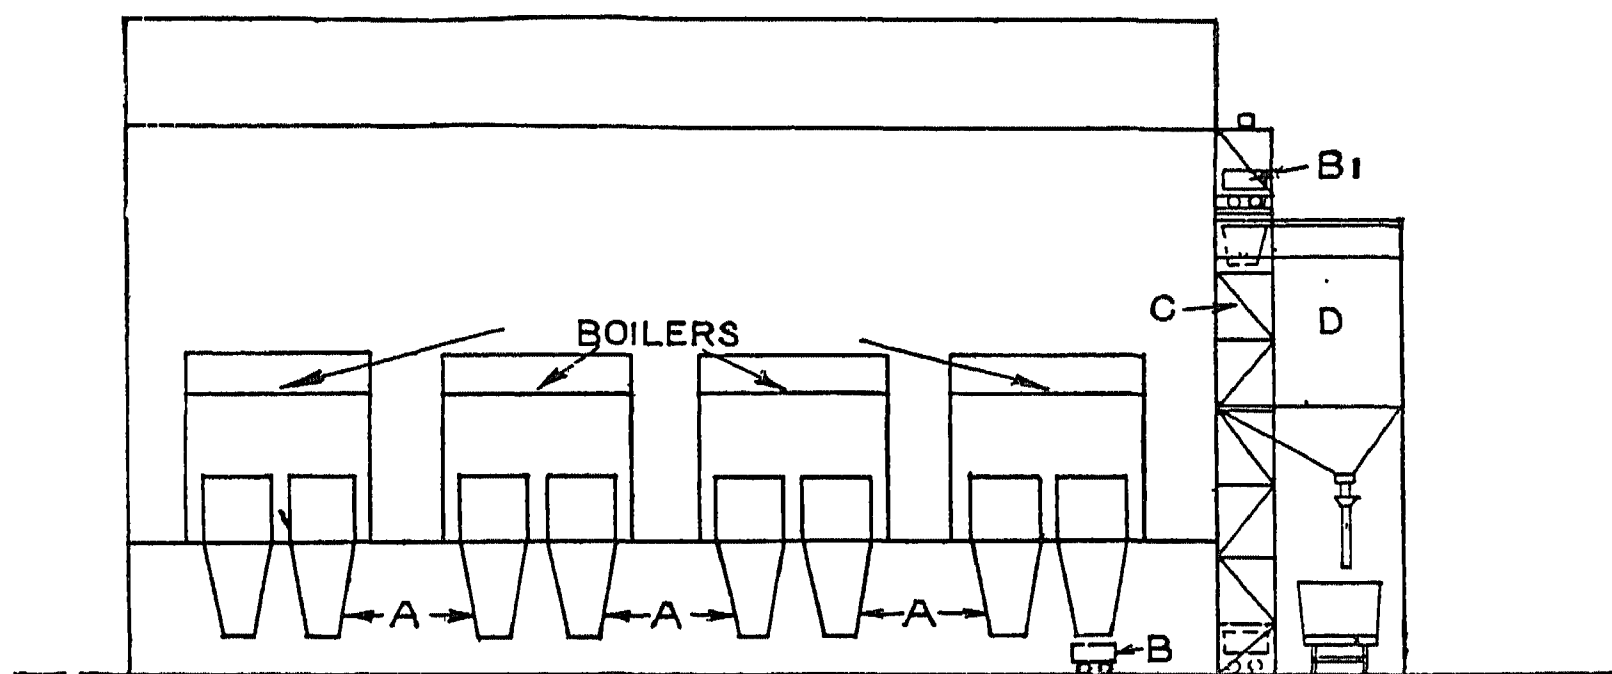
A.—Typical Arrangement of Ash Handling Plant with Ash Wagons and Ash Wagon Hoist
